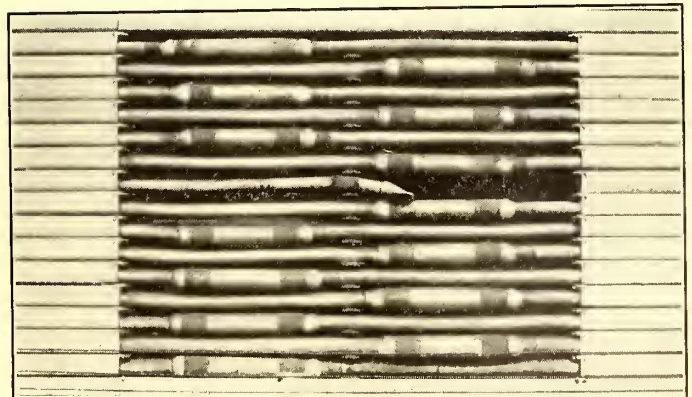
CABLE JOINTS, EARL'S COURT STATION
